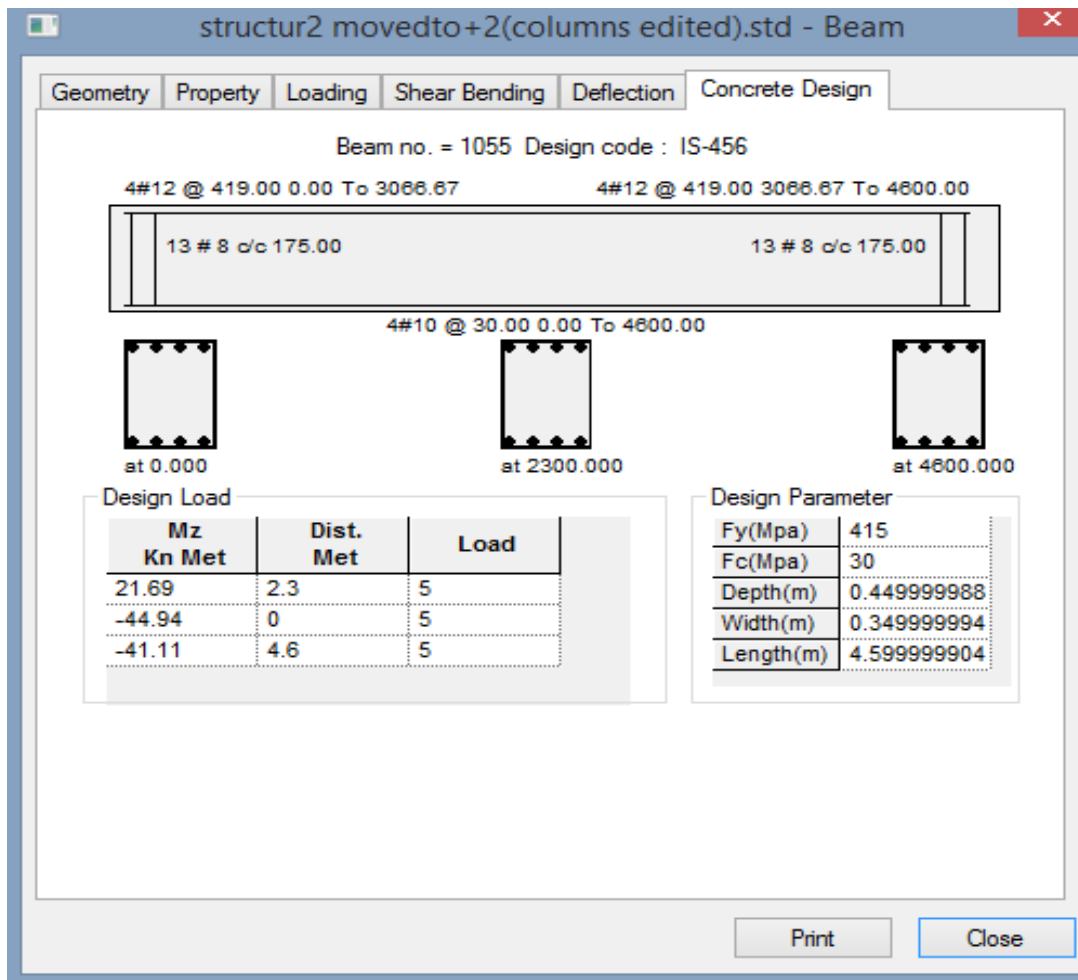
Figure Showing Design of Beams of Size 450×350mm
